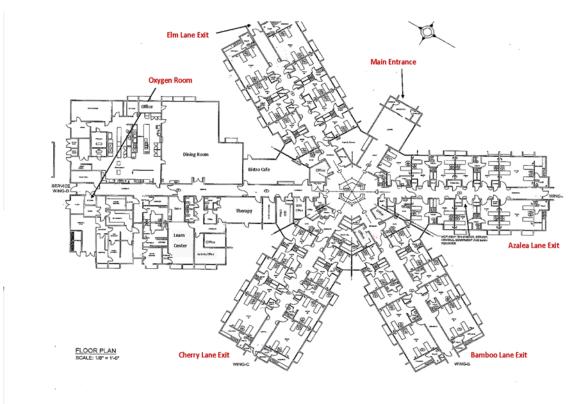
Floor plan of the ACC Care Center, showing the spoke-like pattern of four resident wings.
